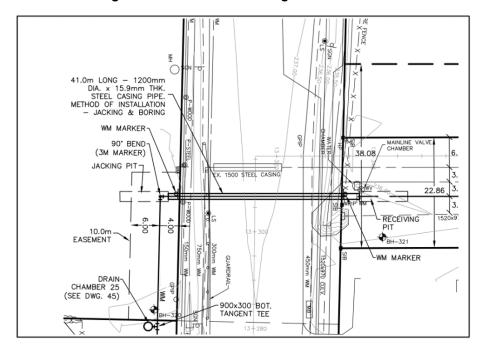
Example of installing a watermain under a major roadway or watercourse using Jack and Bore, or HDD construction method.
